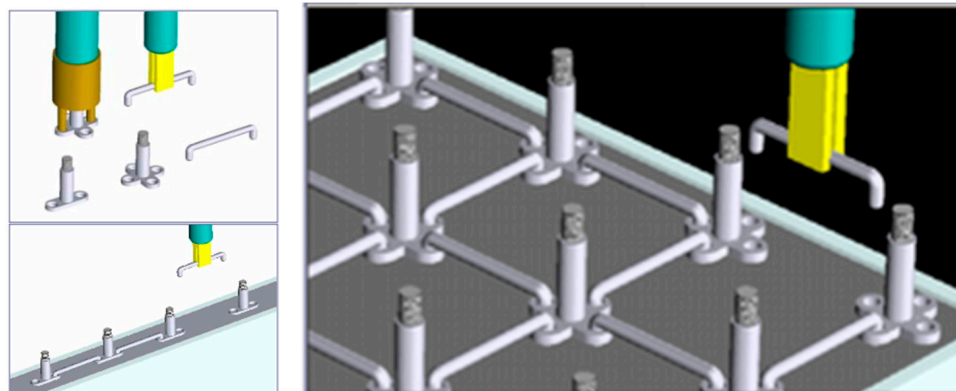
Steel elements reinforcement for printed concrete developed by Khoshnevis [28].
